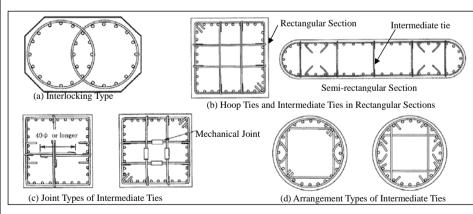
Arrangement of Hoop Ties and Intermediate Ties According to Column Types
